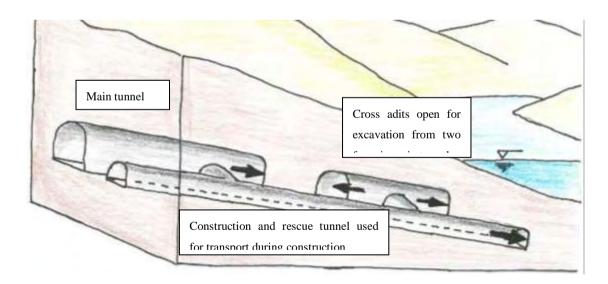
Cross connecting tunnels open for excavation from extra tunnel faces. Transport of tunnel muck goes in the construction/pilot tunnel
